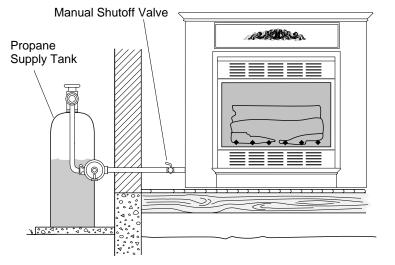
Checking Gas Joints Shown with Optional Mantel
